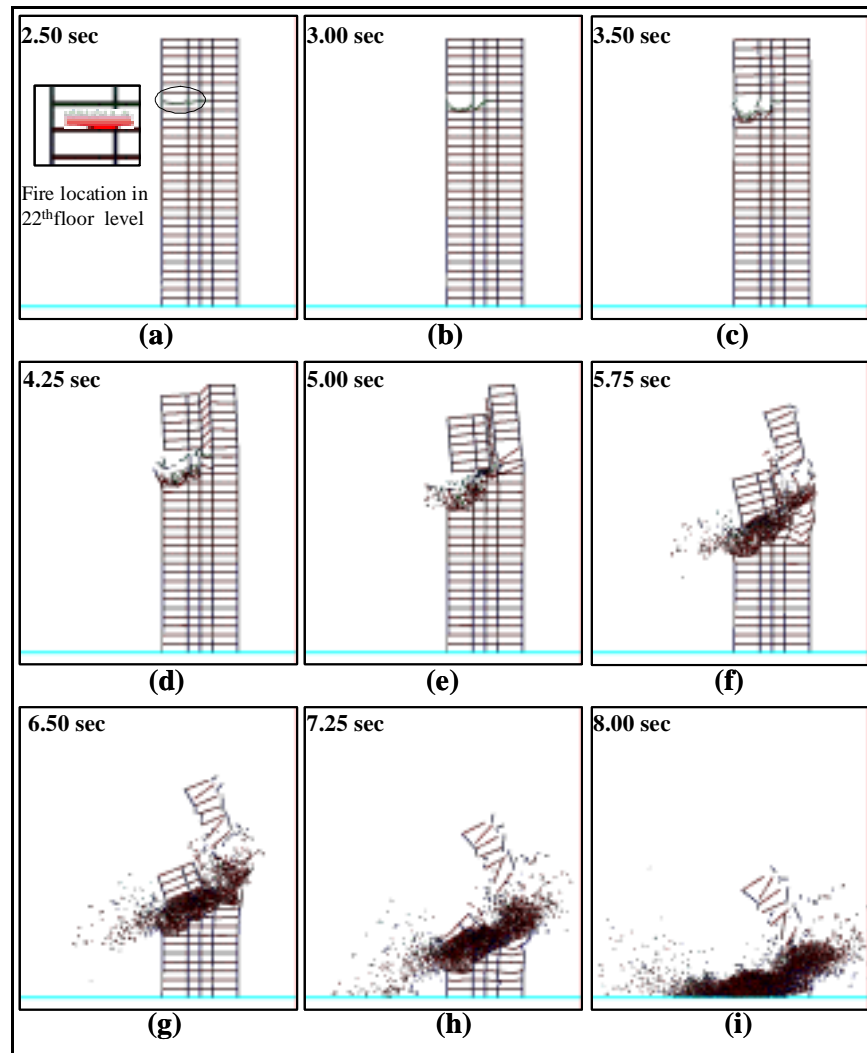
Failure Mechanism of 30-story Steel Structure
